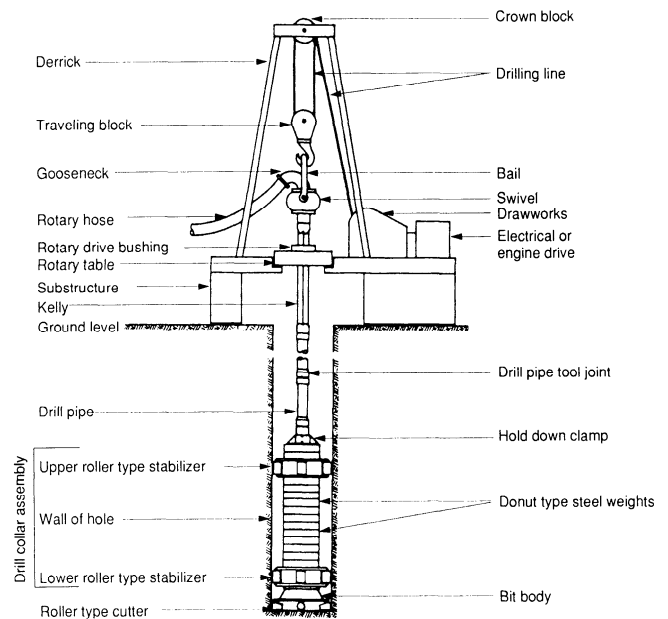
Schematic blind shaft drilling equipment setup.
